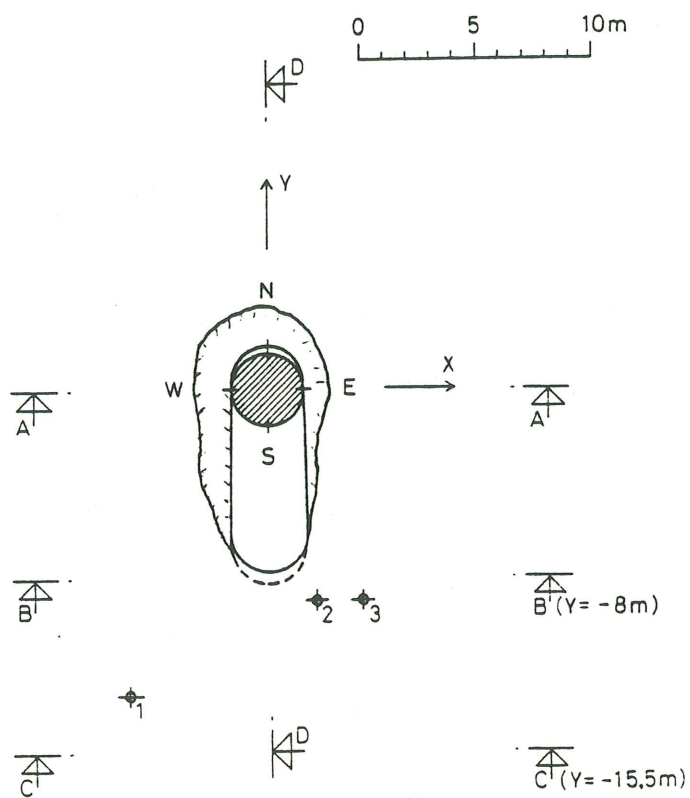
Site plan of the drilled profiles close to the lightpier
